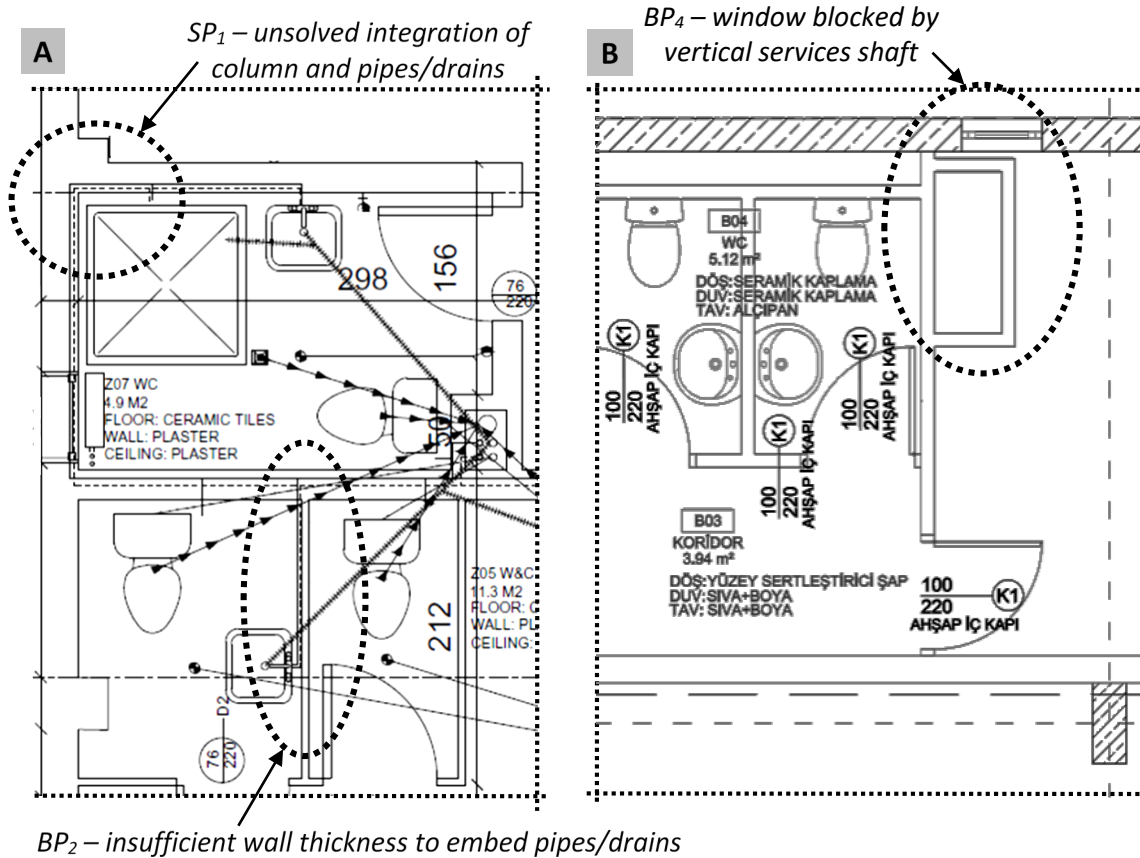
Examples of (A) BP₂, SP₁ and (B) BP₄.
